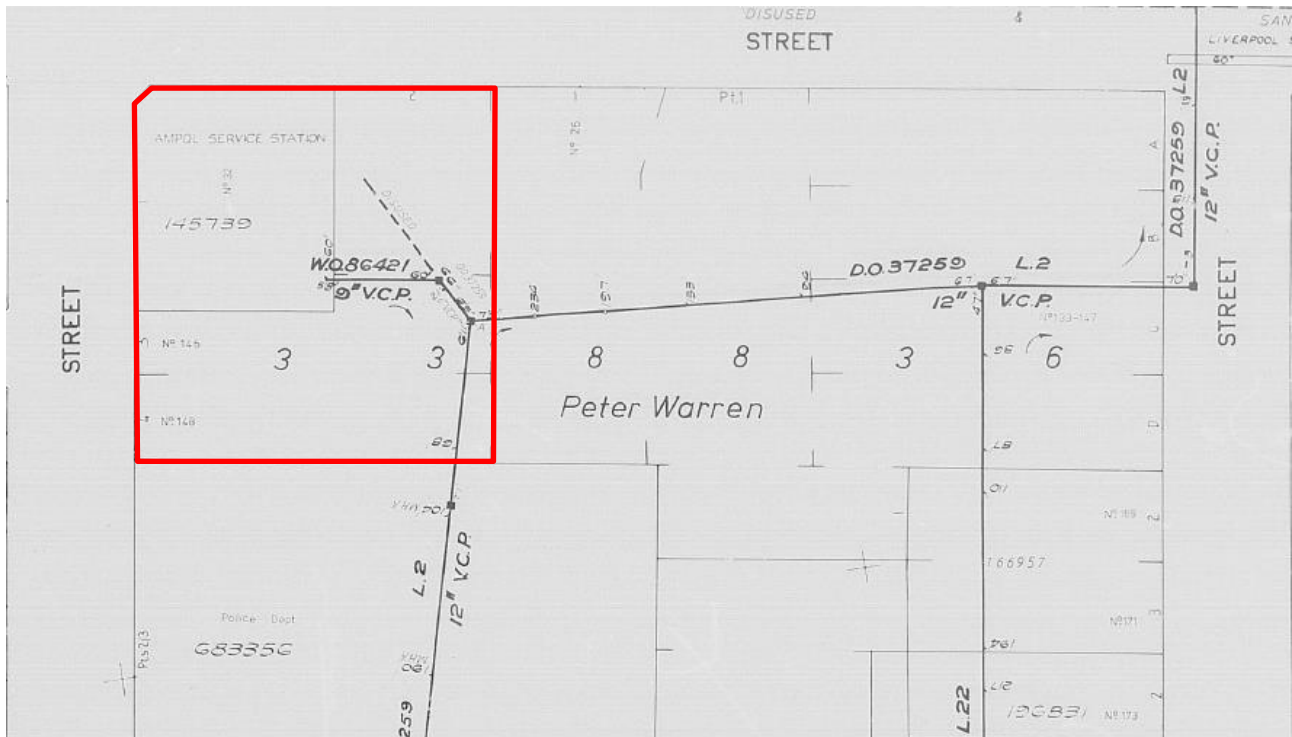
C.1969 Plan of the site showing Peter Warren Dealership and Ampol service station. Subject site indicated in red.
